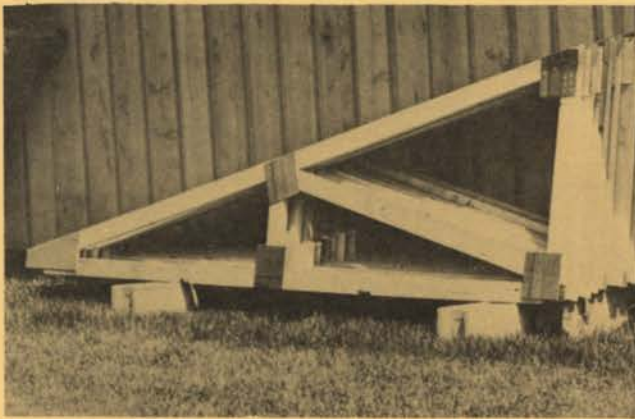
Twelve-foot half-truss with panel cutout material as gussets.
